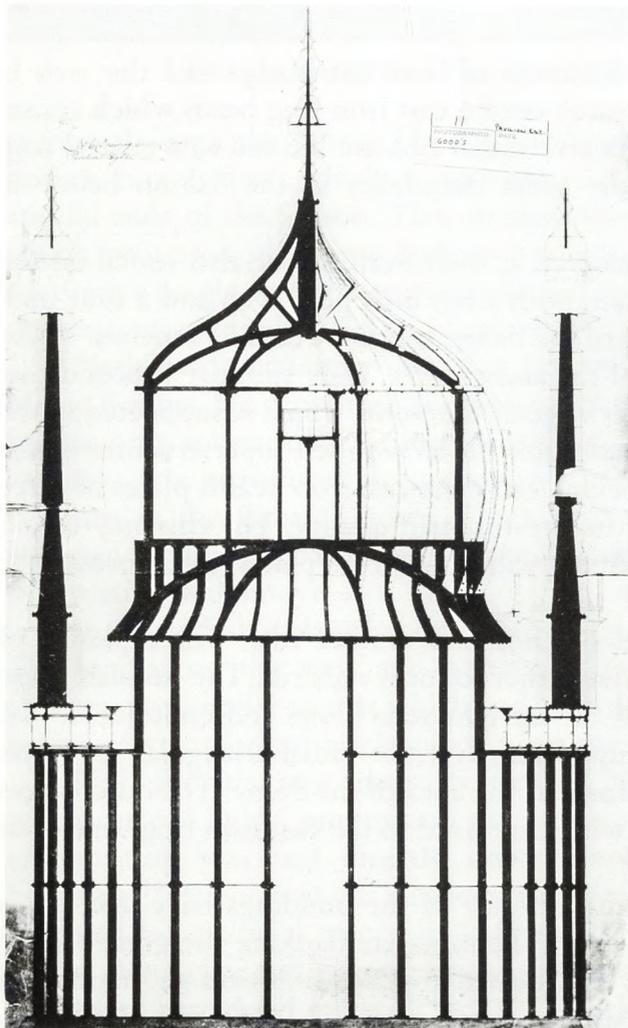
Brighton Pavilion, section through Saloon, drawing by William Nixon, 1827
